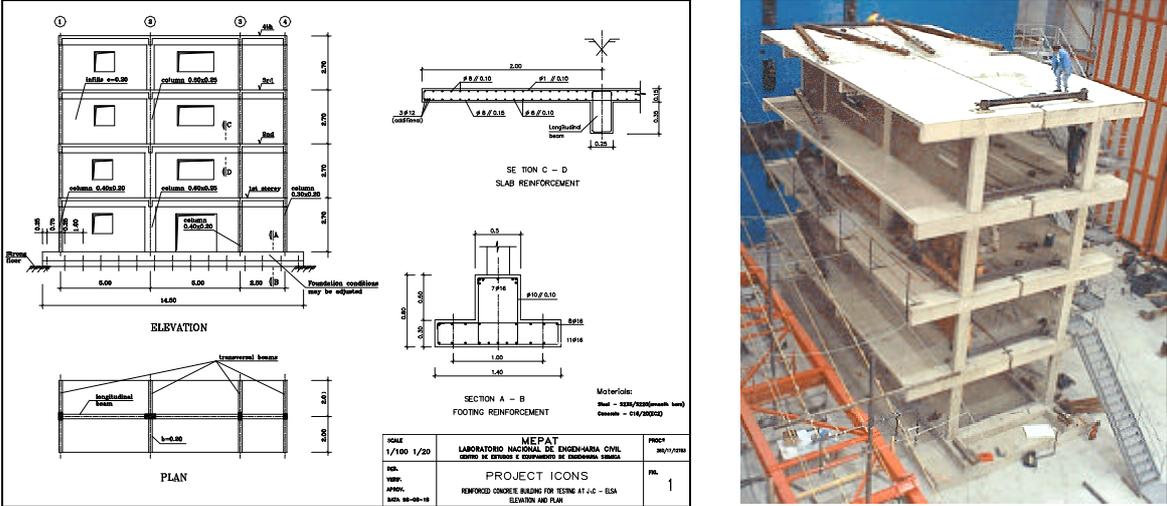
Plan and elevation views for the frame plus infills (left); Models in the ELSA laboratory (right)
